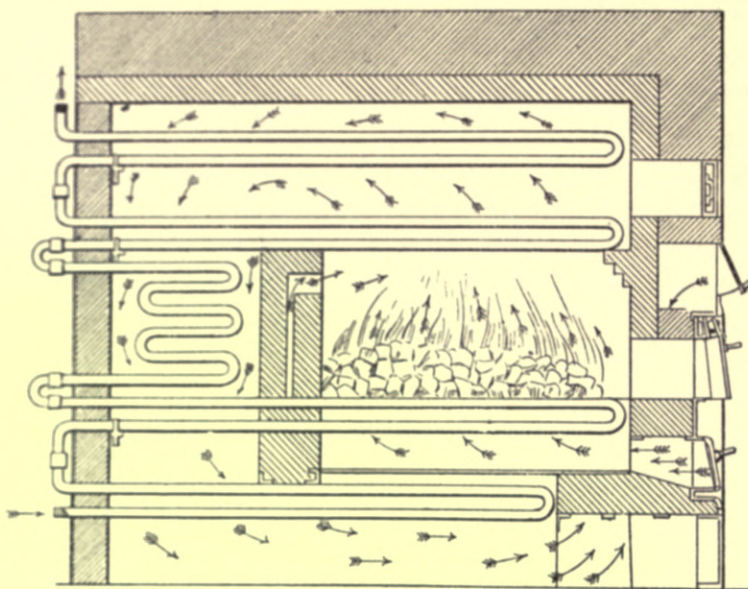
Section of the "Renton Gibbs" Tubular Boiler.
